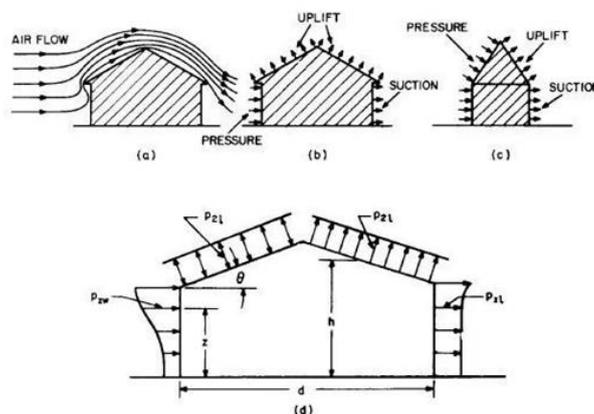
Effects of wind on a low building with pitched roof. (a) Airflow at the building. (b) Wind applies inward pressure against the windward wall, suction on the leeward wall, and uplift over all of a roof with slight slopes. (c) With a steep roof, inward pressure acts on the windward side of the roof and uplift only on the leeward side. (d) Pressure distribution along walls and roof assumed for design of wind bracing of a building.
